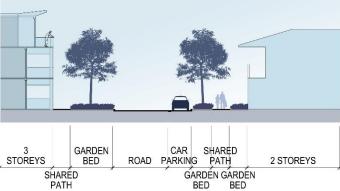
Local Streets Plan Extract and Indicative Cross-Section
